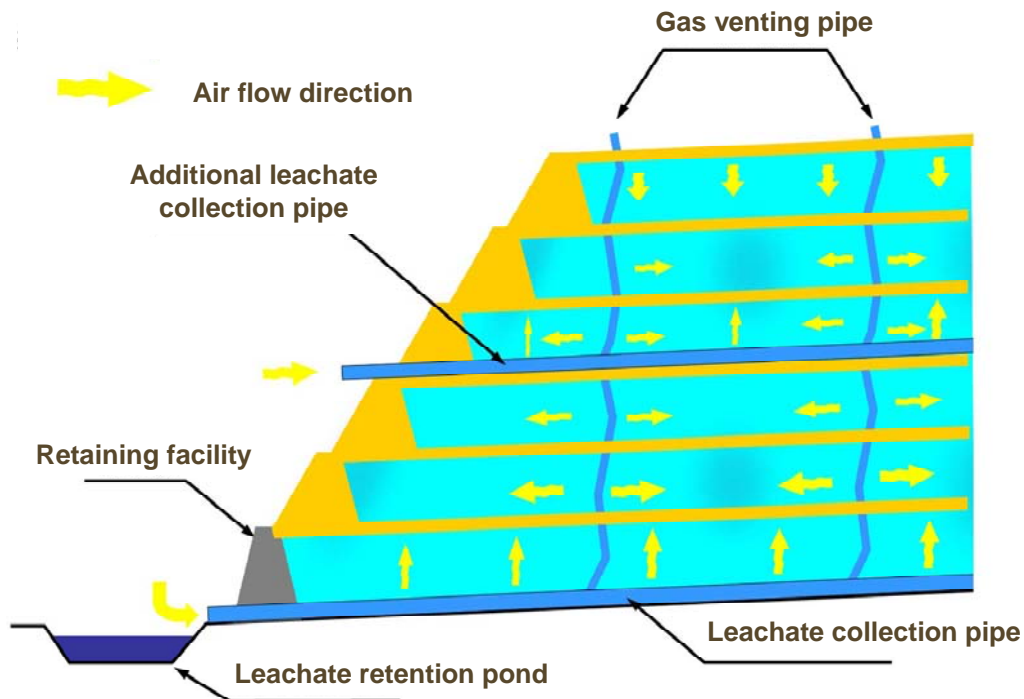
Installation of Additional Leachate Collection Pipes in Deep Waste Layer
